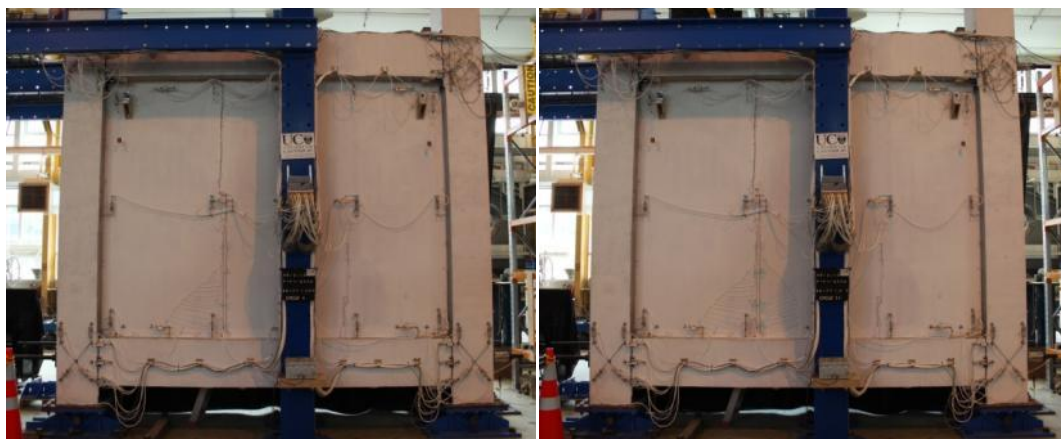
As built steel framed drywall specimen FIF1-STFD: a) 0.3% drift, b) 0.4% drift
